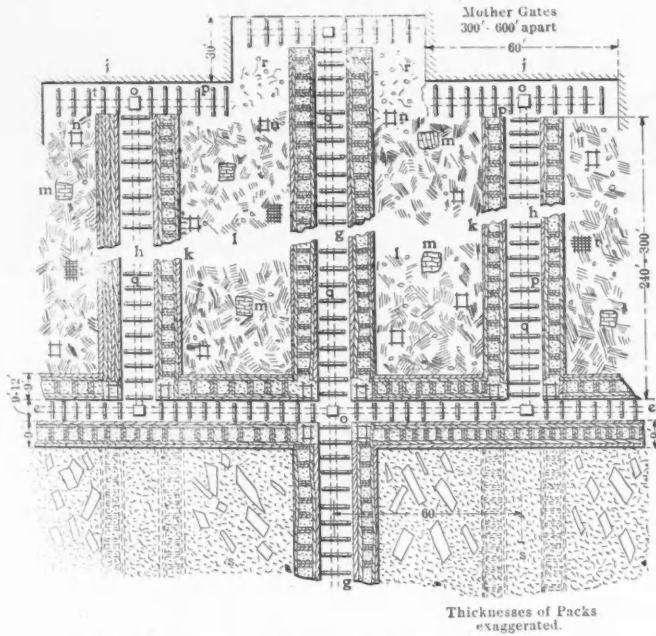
DETAILED PLAN OF LONGWALL AT THE FACE
